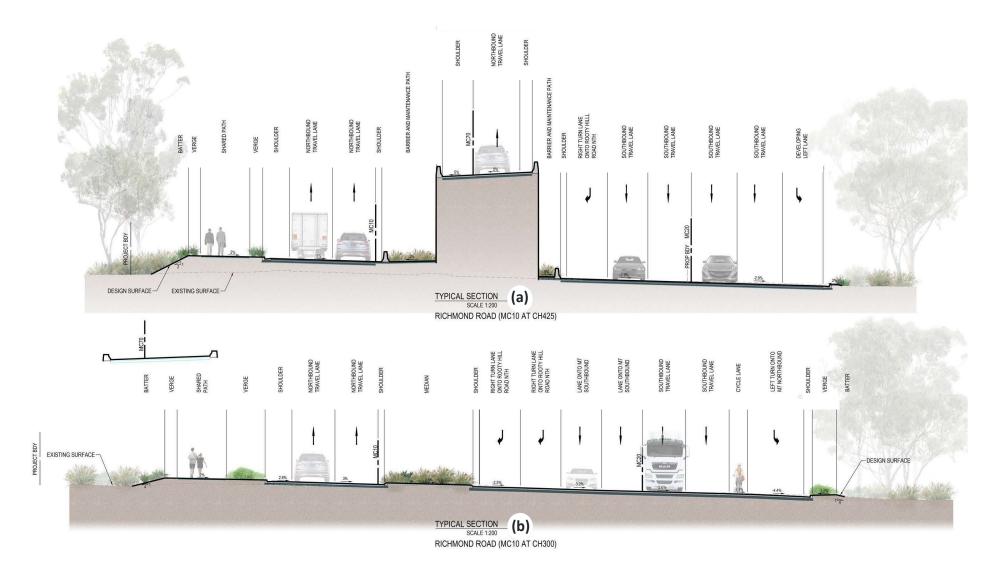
Typical cross sections of Richmond Road around (a) 175 metres and (b) 50 metres north of the Rooty Hill Road North / M7 Motorway on/off ramps intersection
